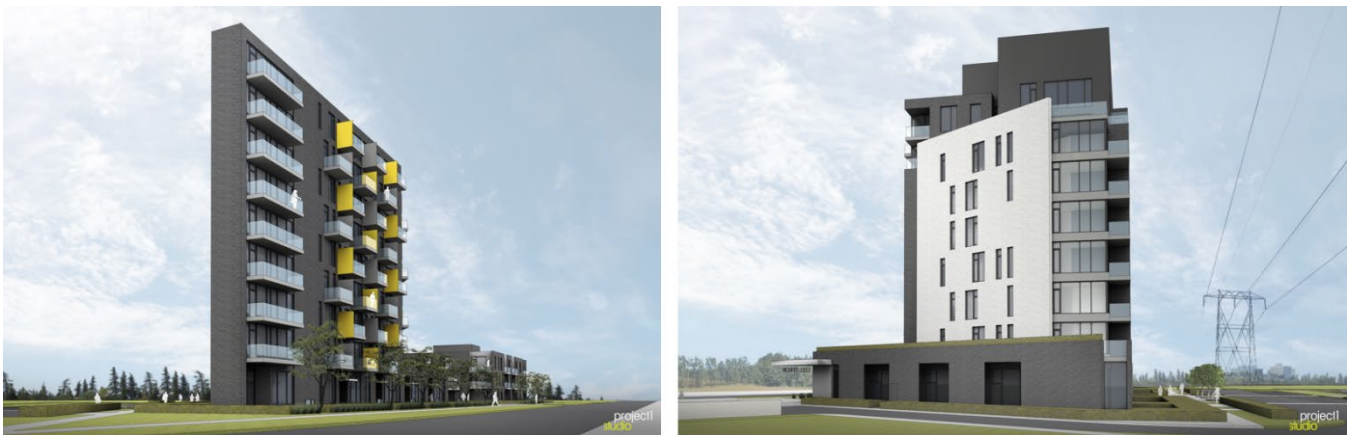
West (Left) and Southeast (Right) Views of the Proposed Development
